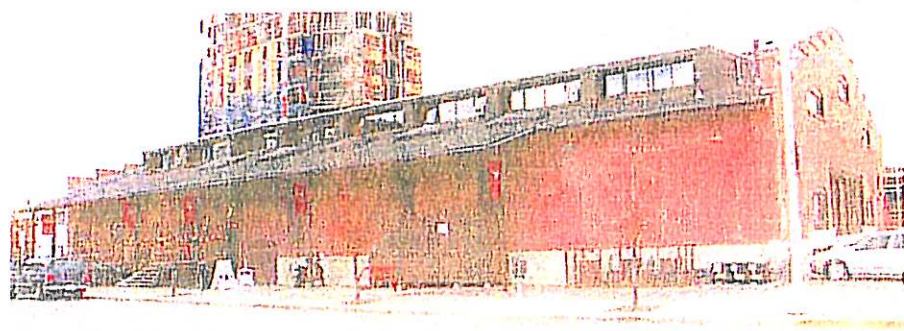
Current fenestration on north elevation. Note openings blocked at west end
